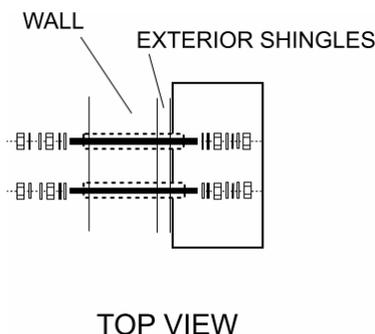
A partial top view of figure 11 showing the wall and connections to the outside.
